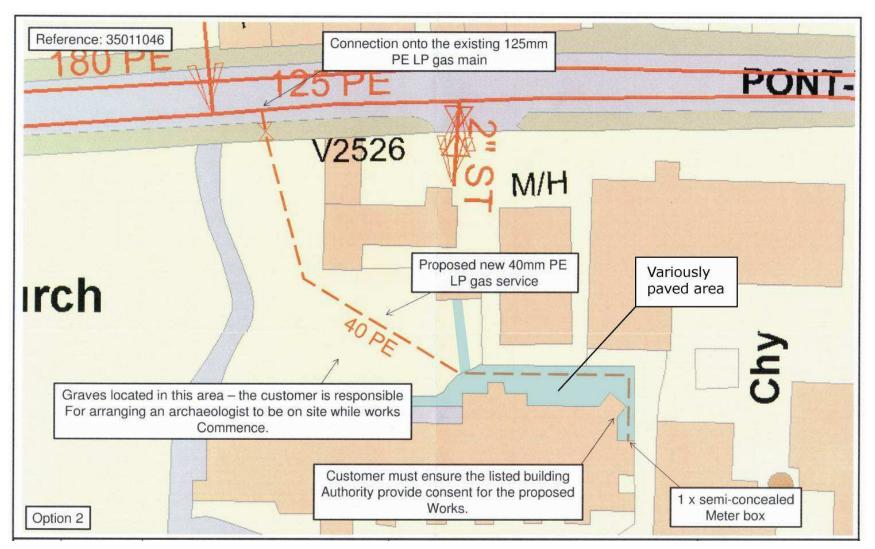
Plan showing the pipeline route and paved area (based on West and Wales Utilities plan provided by the client)
